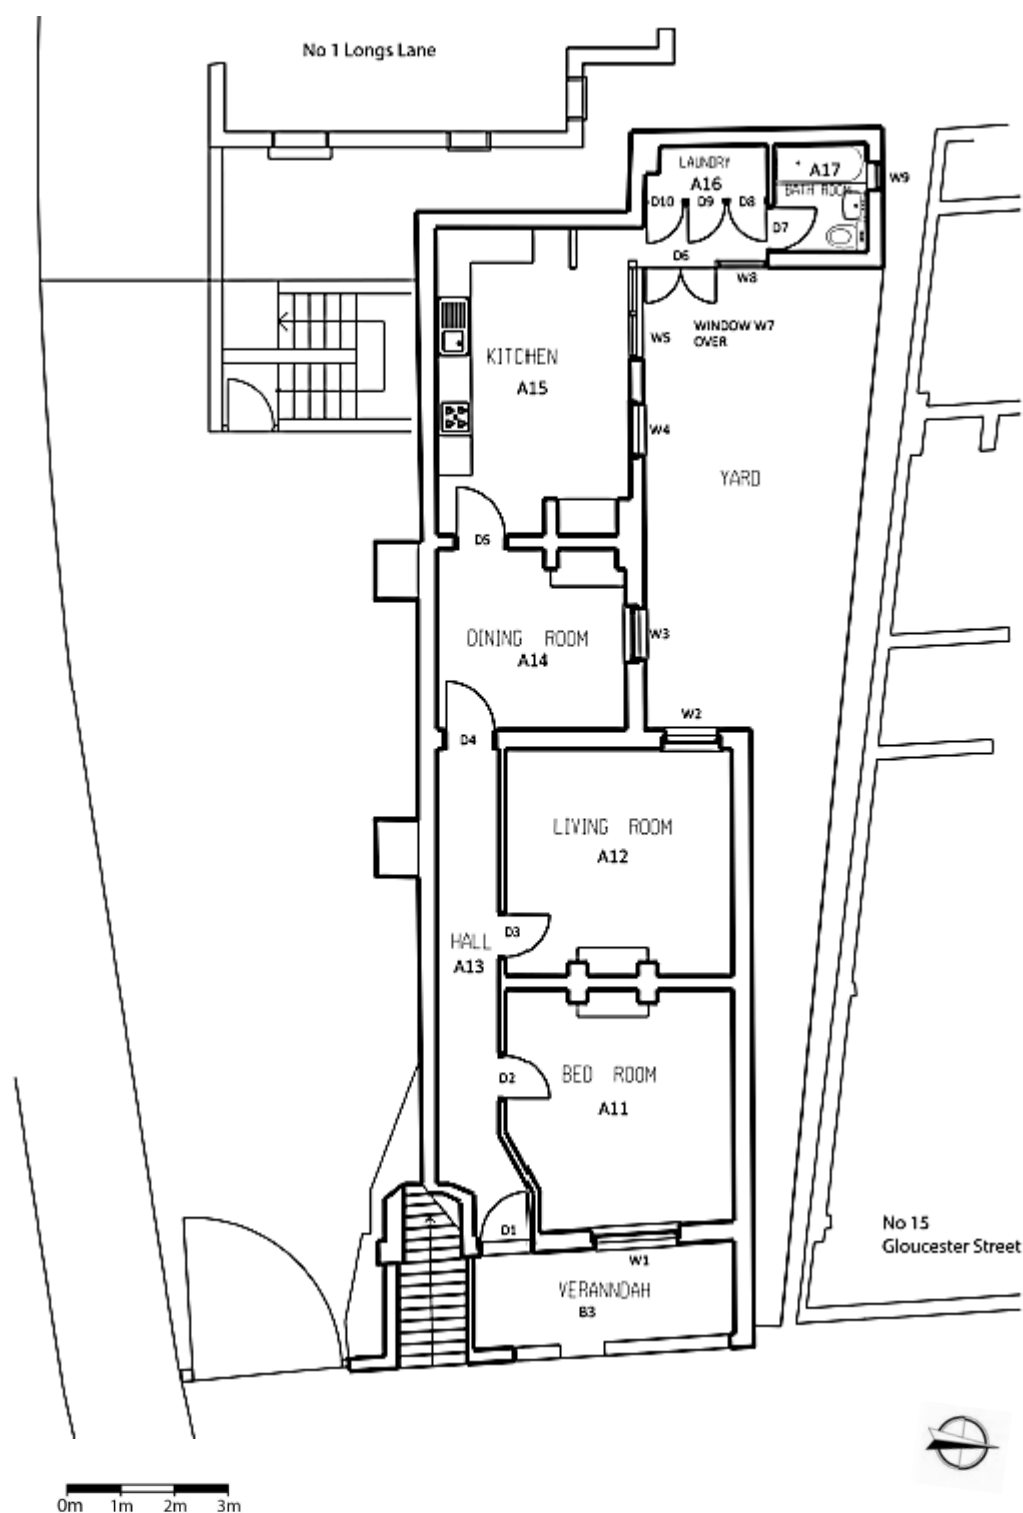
117-117A Gloucester Street – Site plan and ground floor plan. Source: Sydney harbour Foreshore Authority
